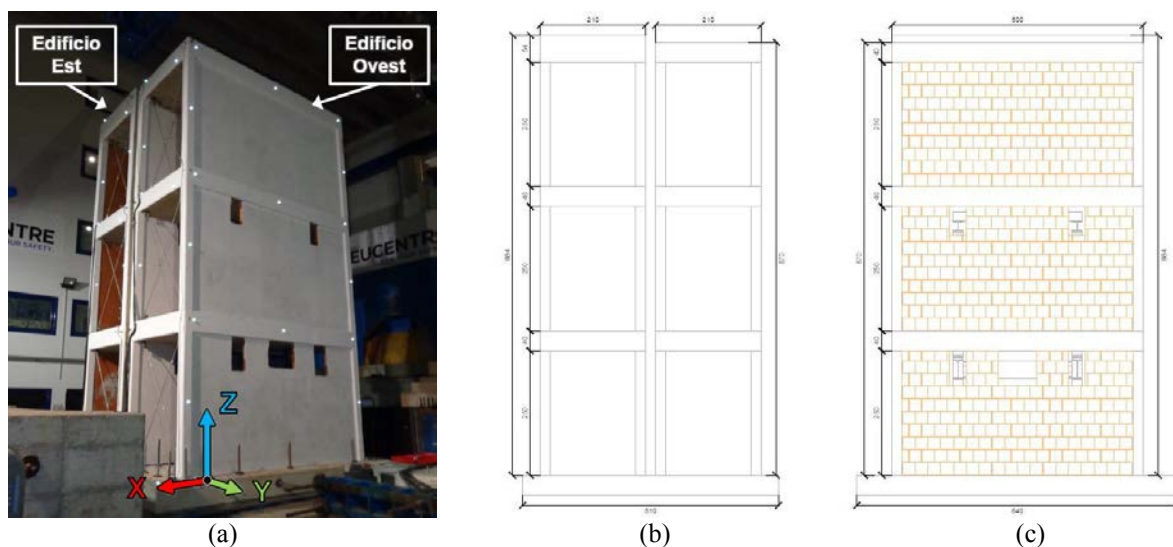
Specimens from the previous experimental campaign: (a) North-West corner photo; (b) North elevation; (c) West elevation [29].
